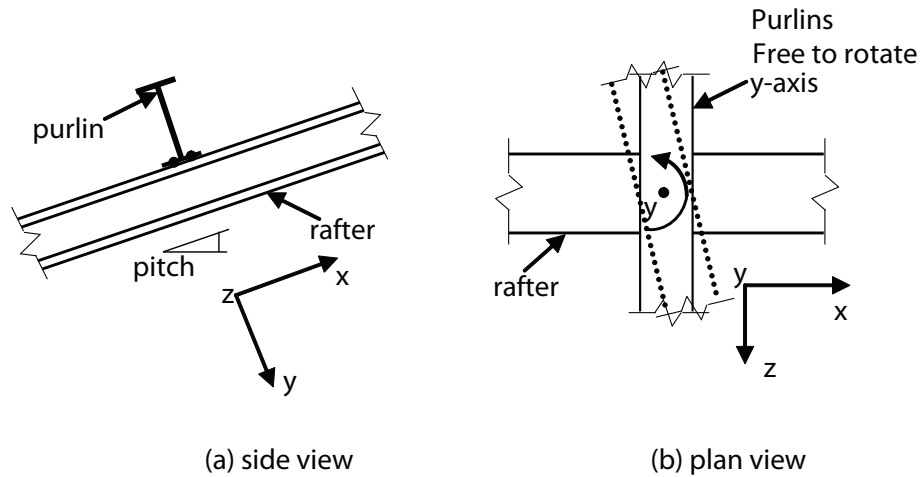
Details of connection between purlins and rafters as used by Moss et al. (2009) and Bong (2005)
